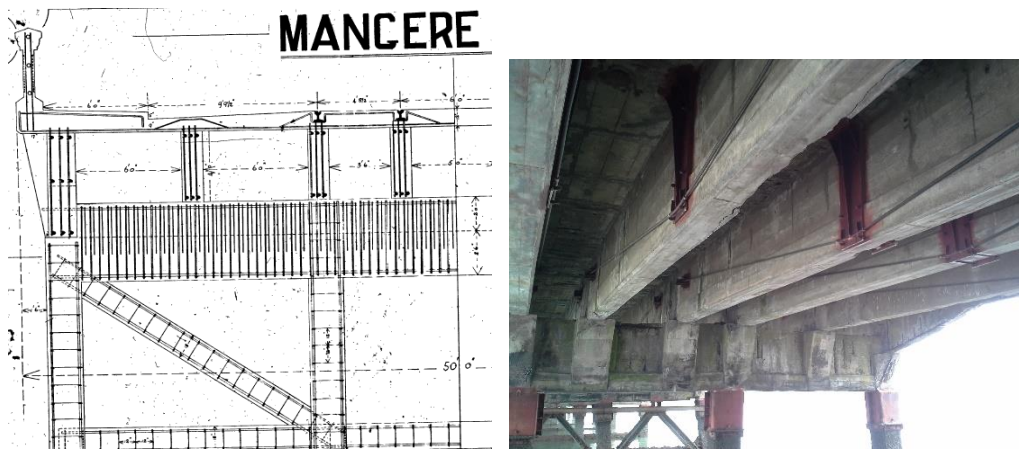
Part of original cross section and photo showing underside of the structure. Designed diagonal bracing is not evident beneath the bridge.
